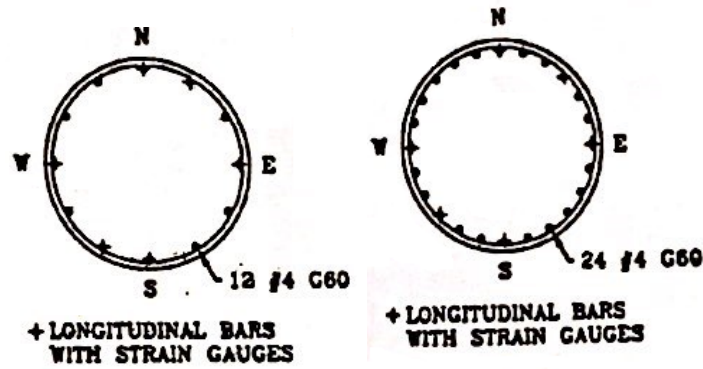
Cross Section of Test Specimens (Priestley and Benzoni, 1996).
